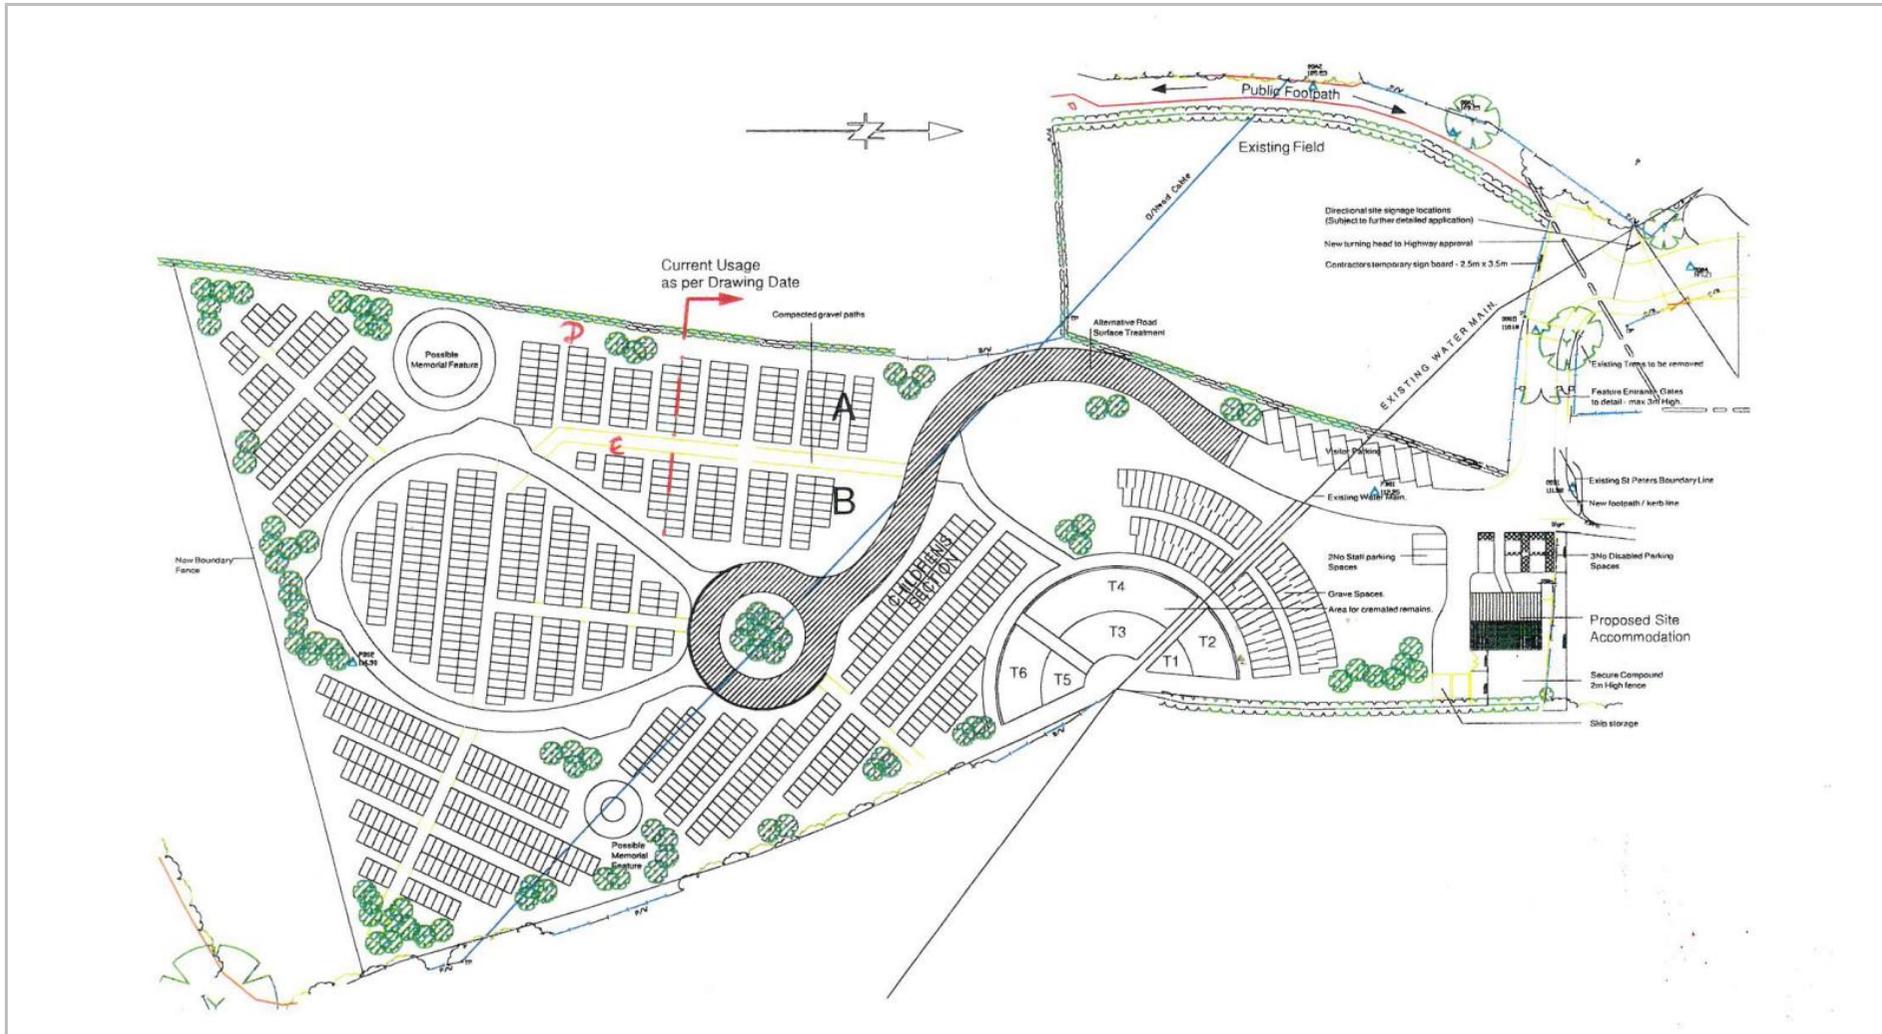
Congelton Cemetery Indicative Burial Layout Plan
